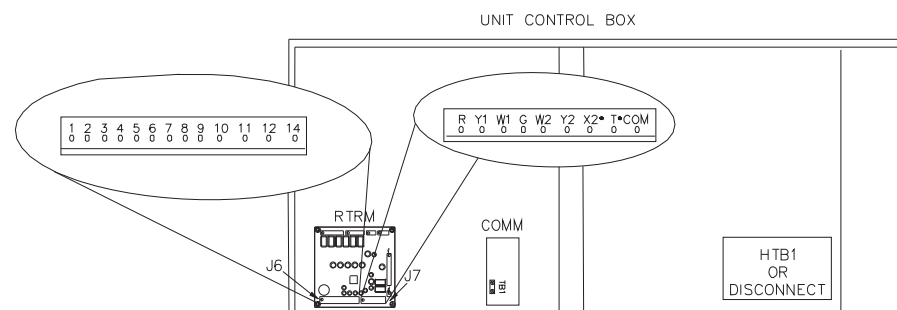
LonTalk® communication interface board mounting and wiring 3 to 5 tons packaged rooftop units (except WSC060E) and 6 to 12.5 tons split system units
